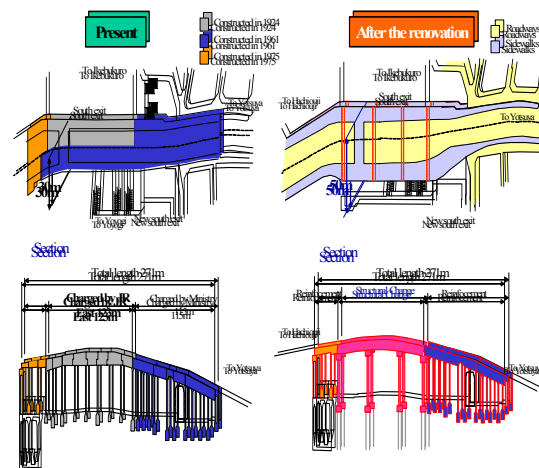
Outline of the Renewal of Shinjuku Over-bridge
